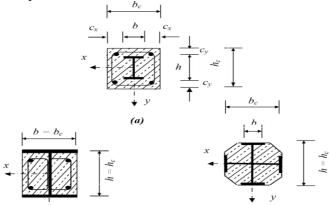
Typical cross - sections of fully and partially concrete encased columns
